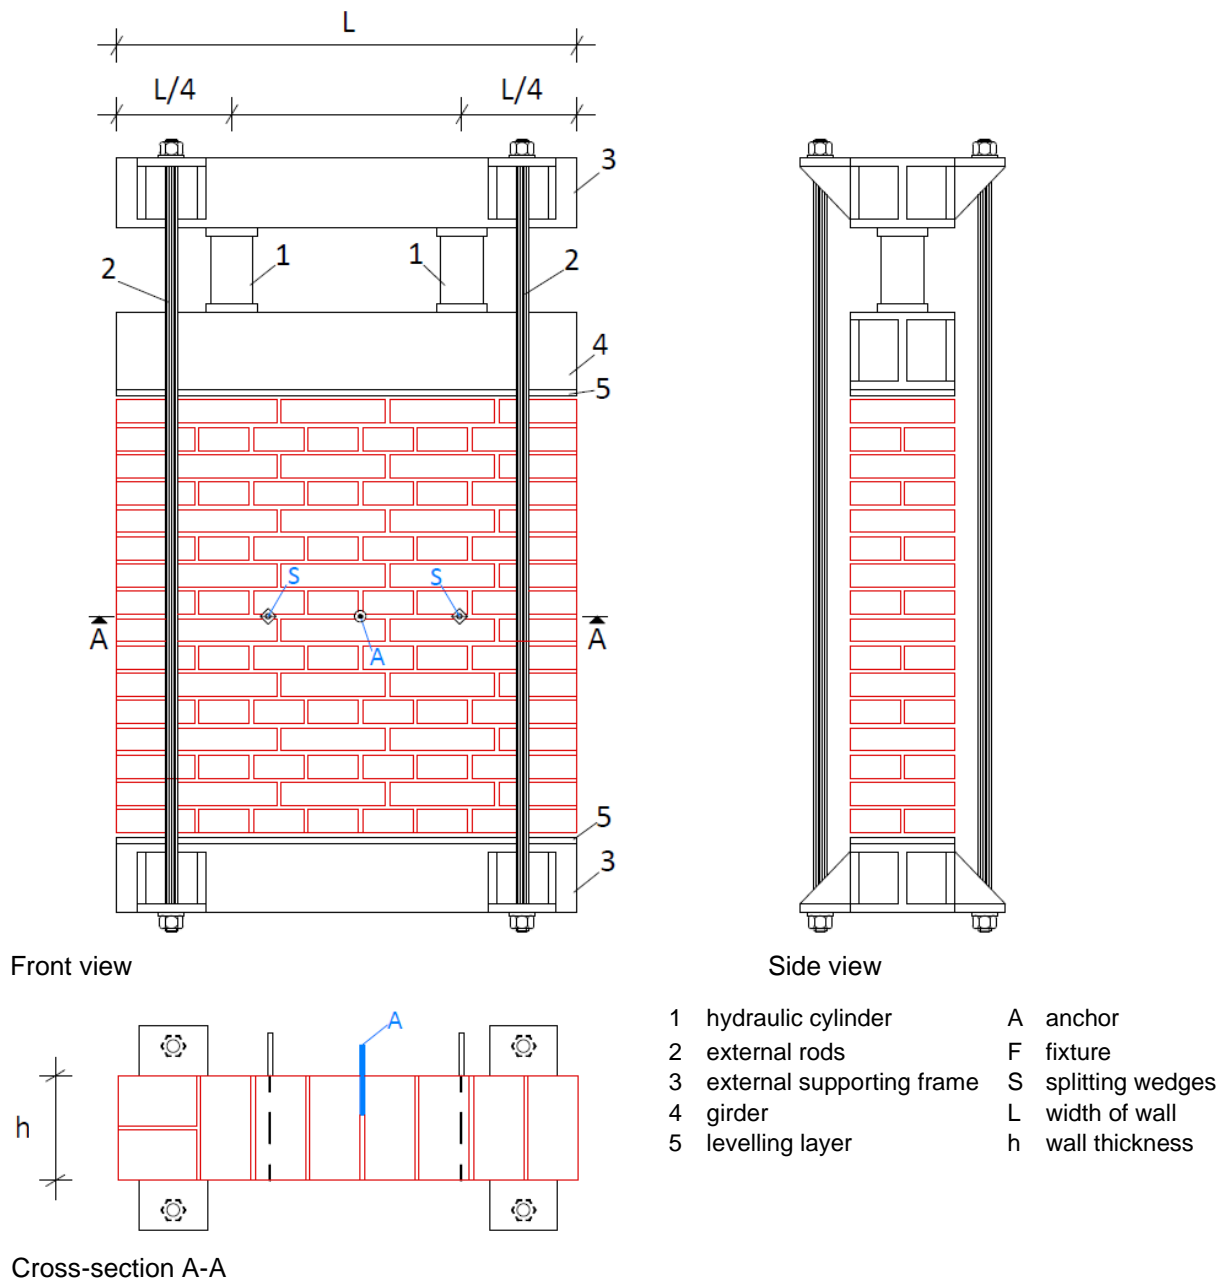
Example for test setup with test member and pre-stressing frame for cracked masonry testing (no external restraints given)
